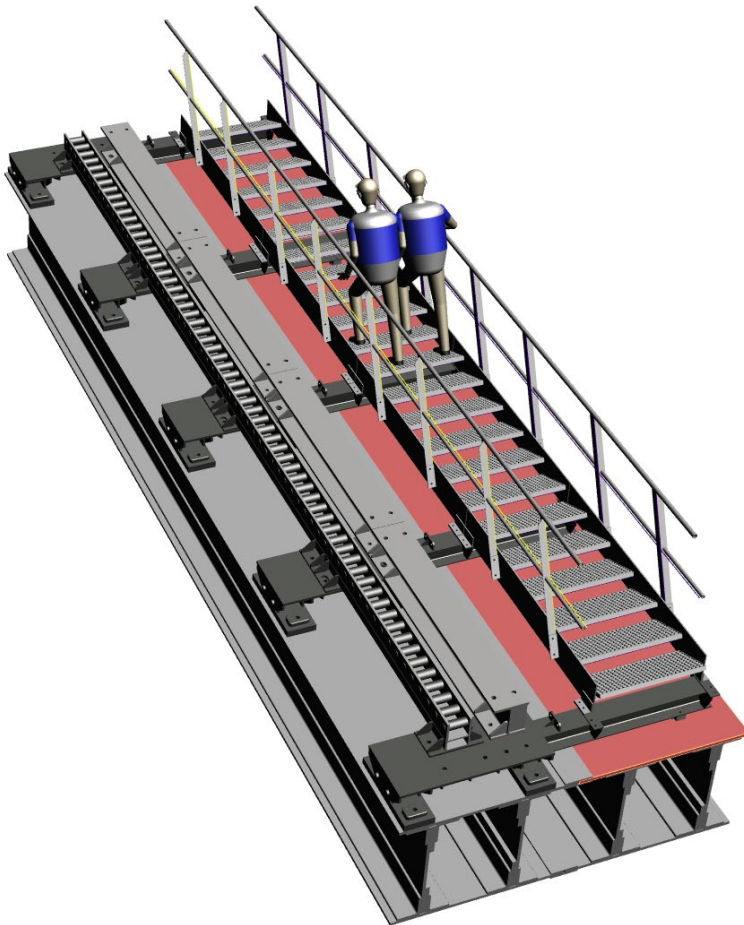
Illustration of new walkway position (Source: Manntech)
